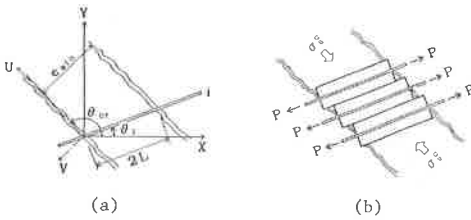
Modeling of Cracked Reinforced Concrete Segment
